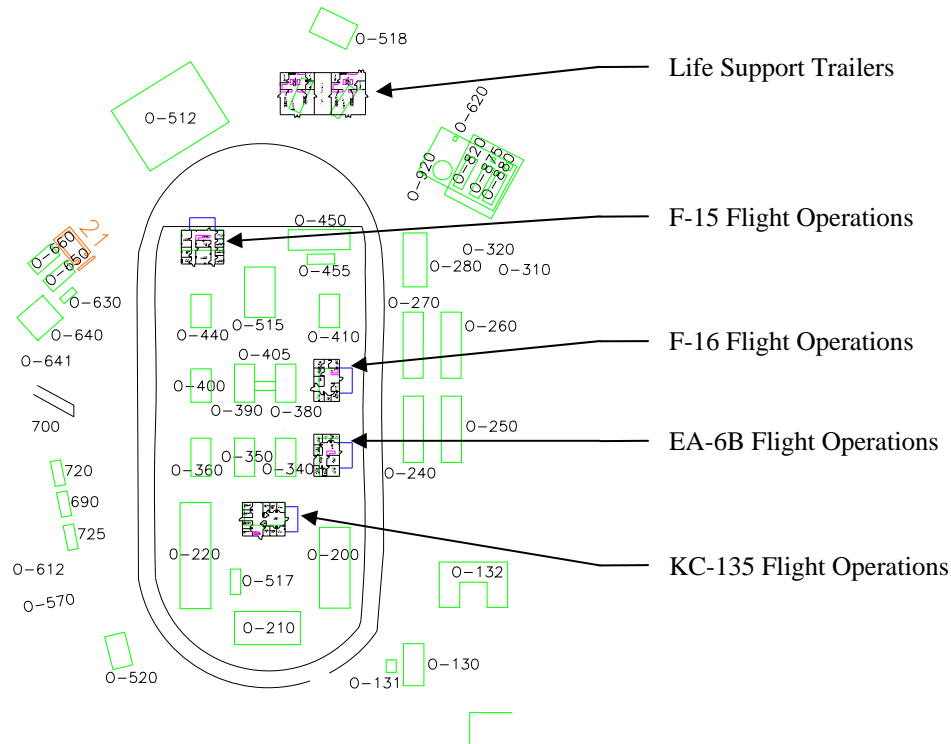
Operations Town Site Plan. The Operations Town trailers were located on a rectangular site.
